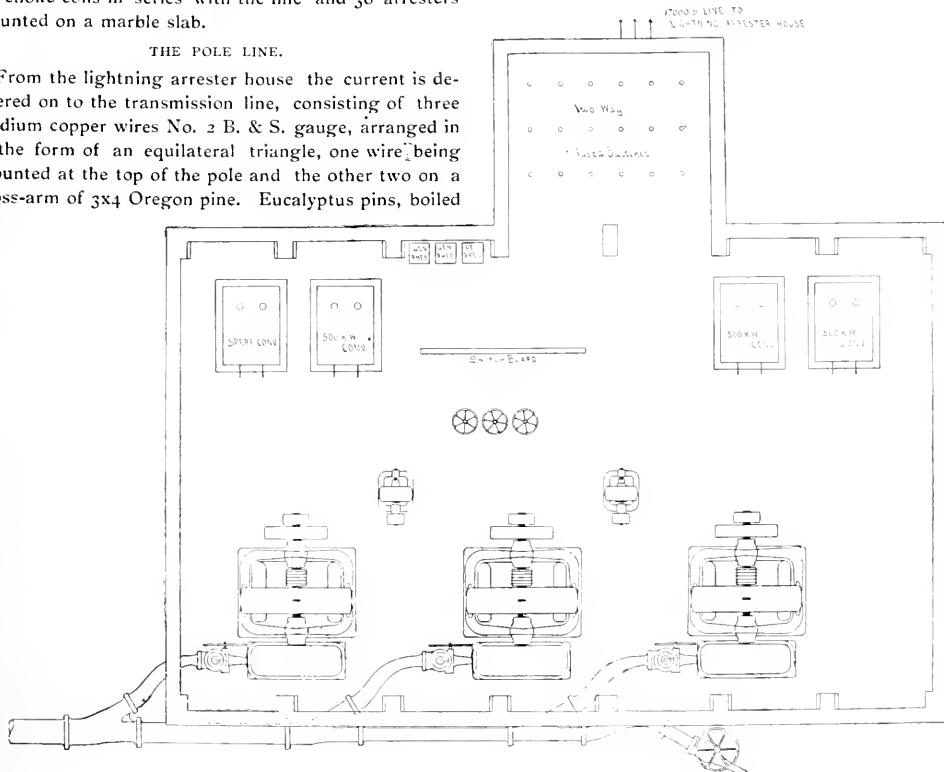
GROUND PLAN OF MOUNT WHITNEY POWER HOUSE.
